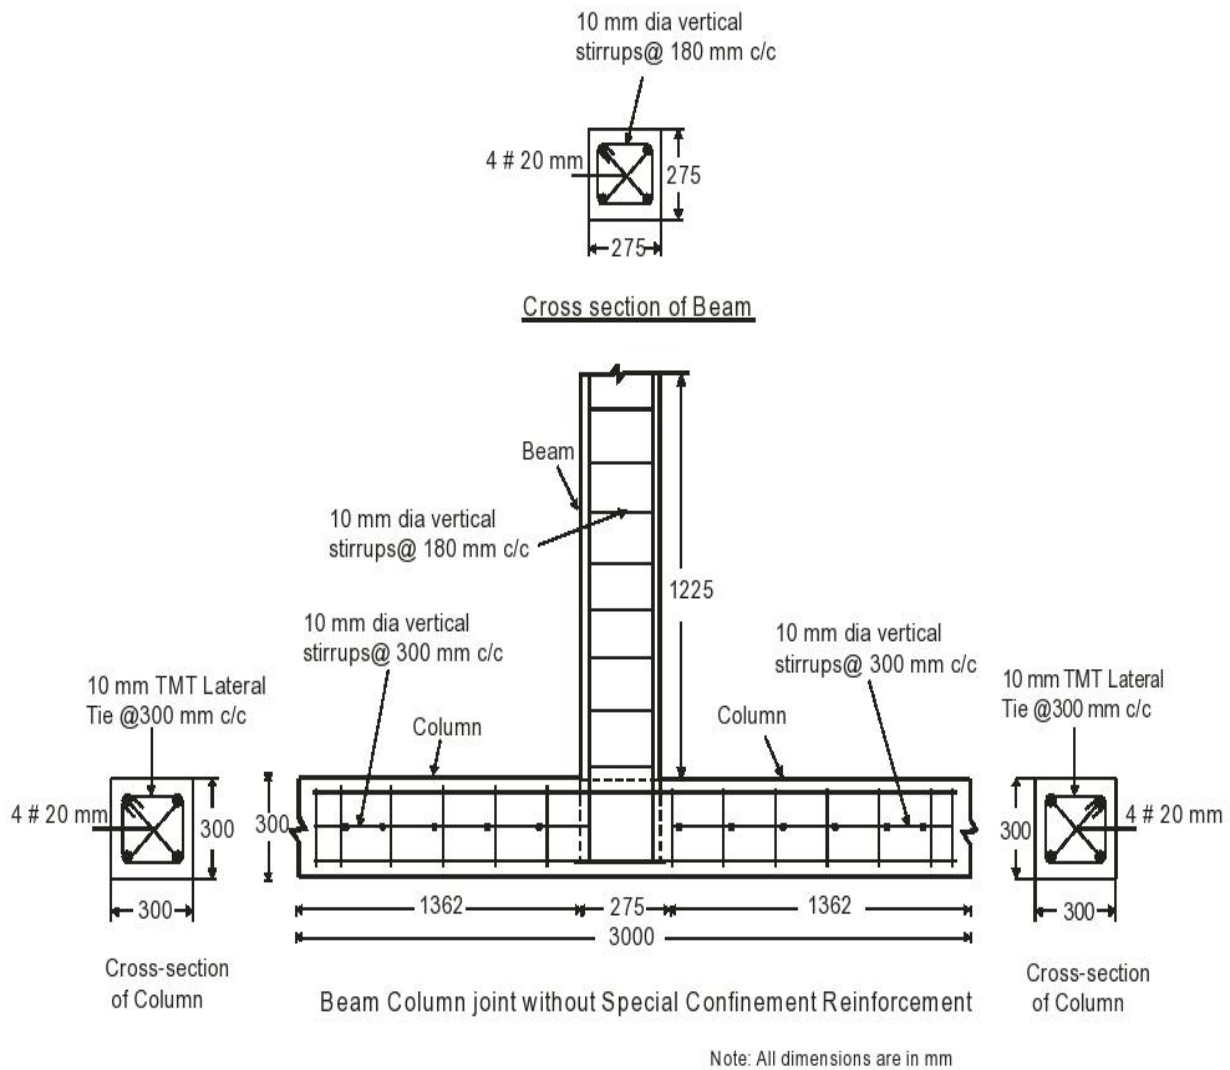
Reinforcement detailing and cross section details of unconfined specimen[10]
